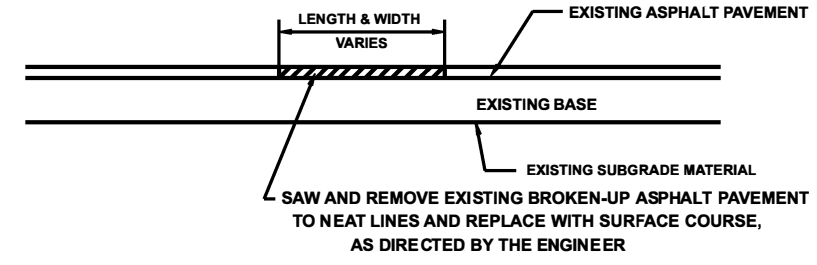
DETAILS OF REPAIRING EXISTING PAVEMENT PRIOR TO RESURFACING FOR FULL DEPTH AND MILLING
